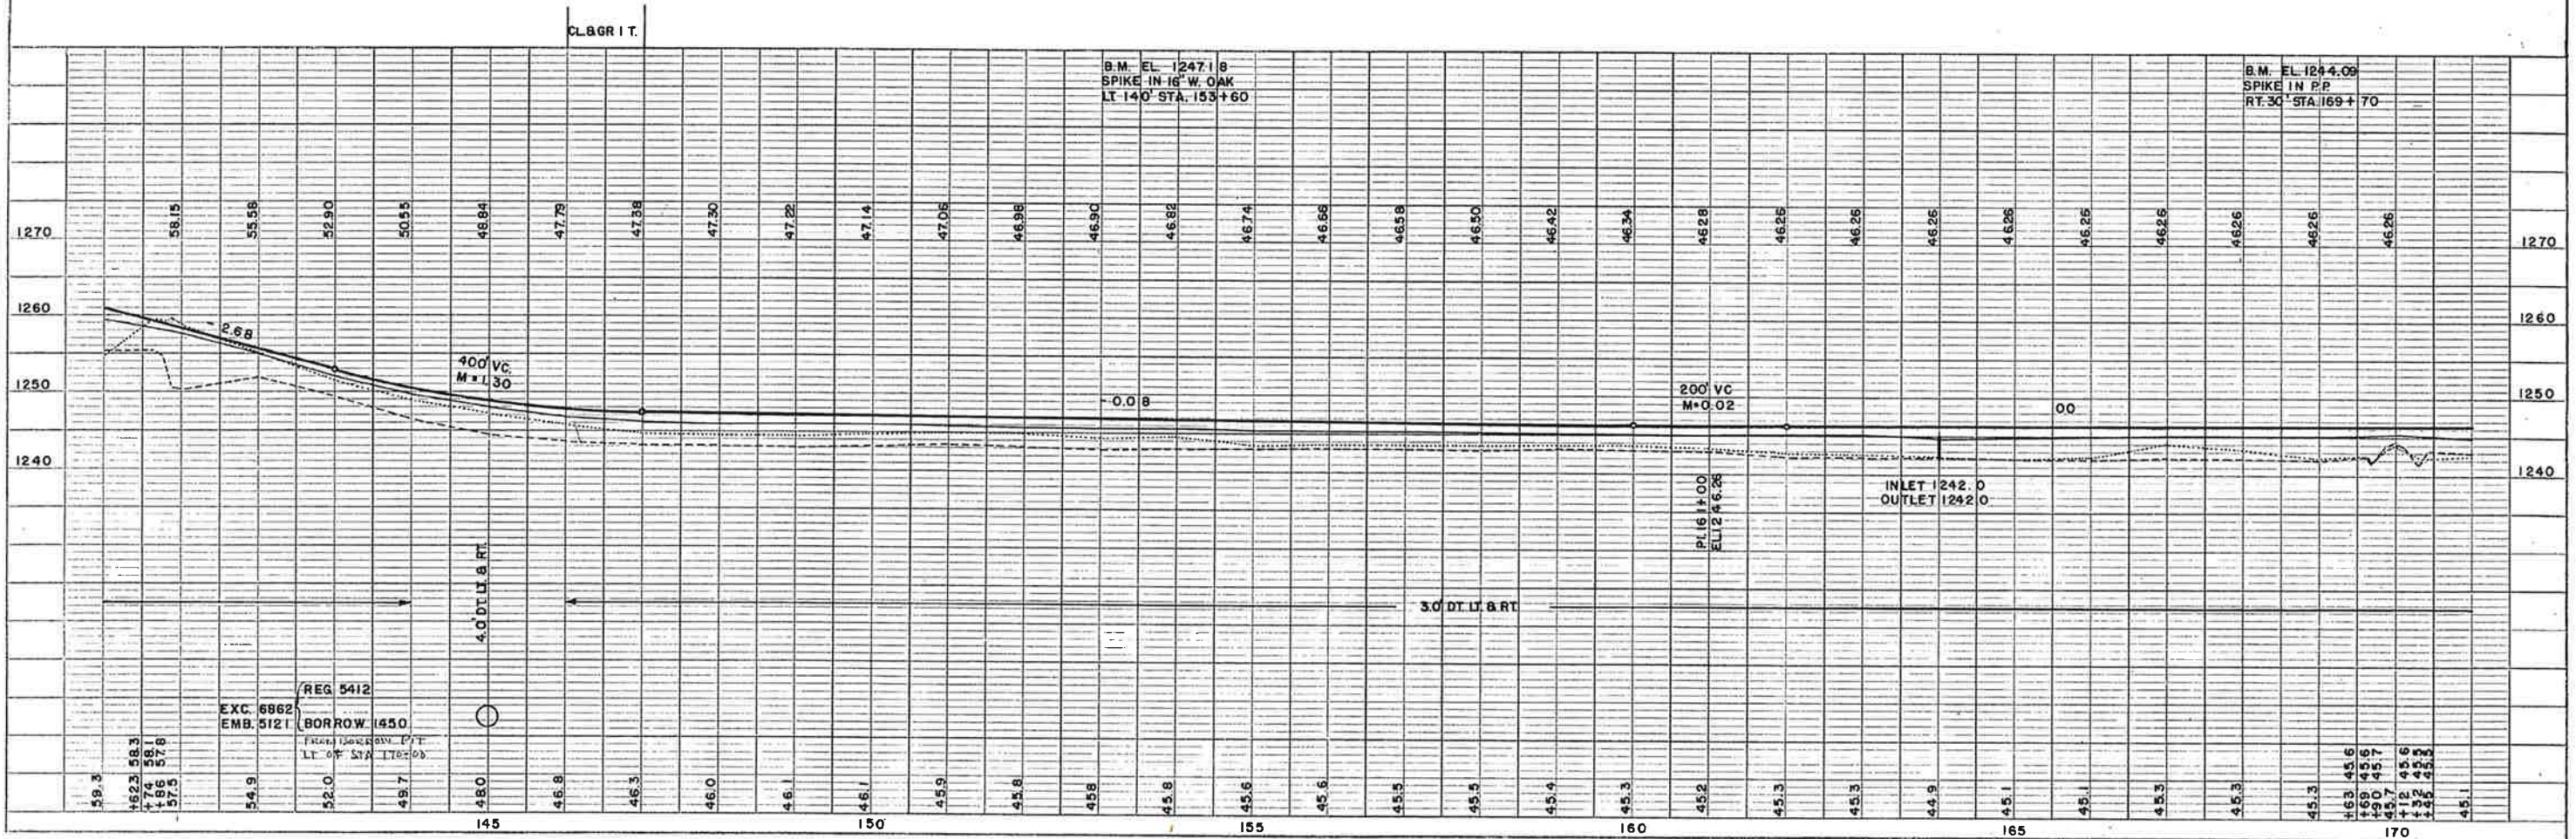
PLAN - PROFILE, S.P. 6.2 & 6.3 STANDARD
